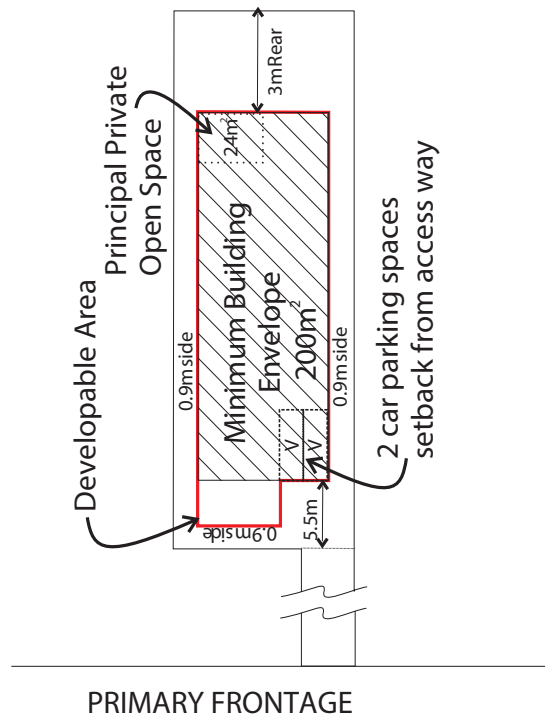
(c): Proposed subdivision plans should identify a potential developable area for each new lot.(l)
